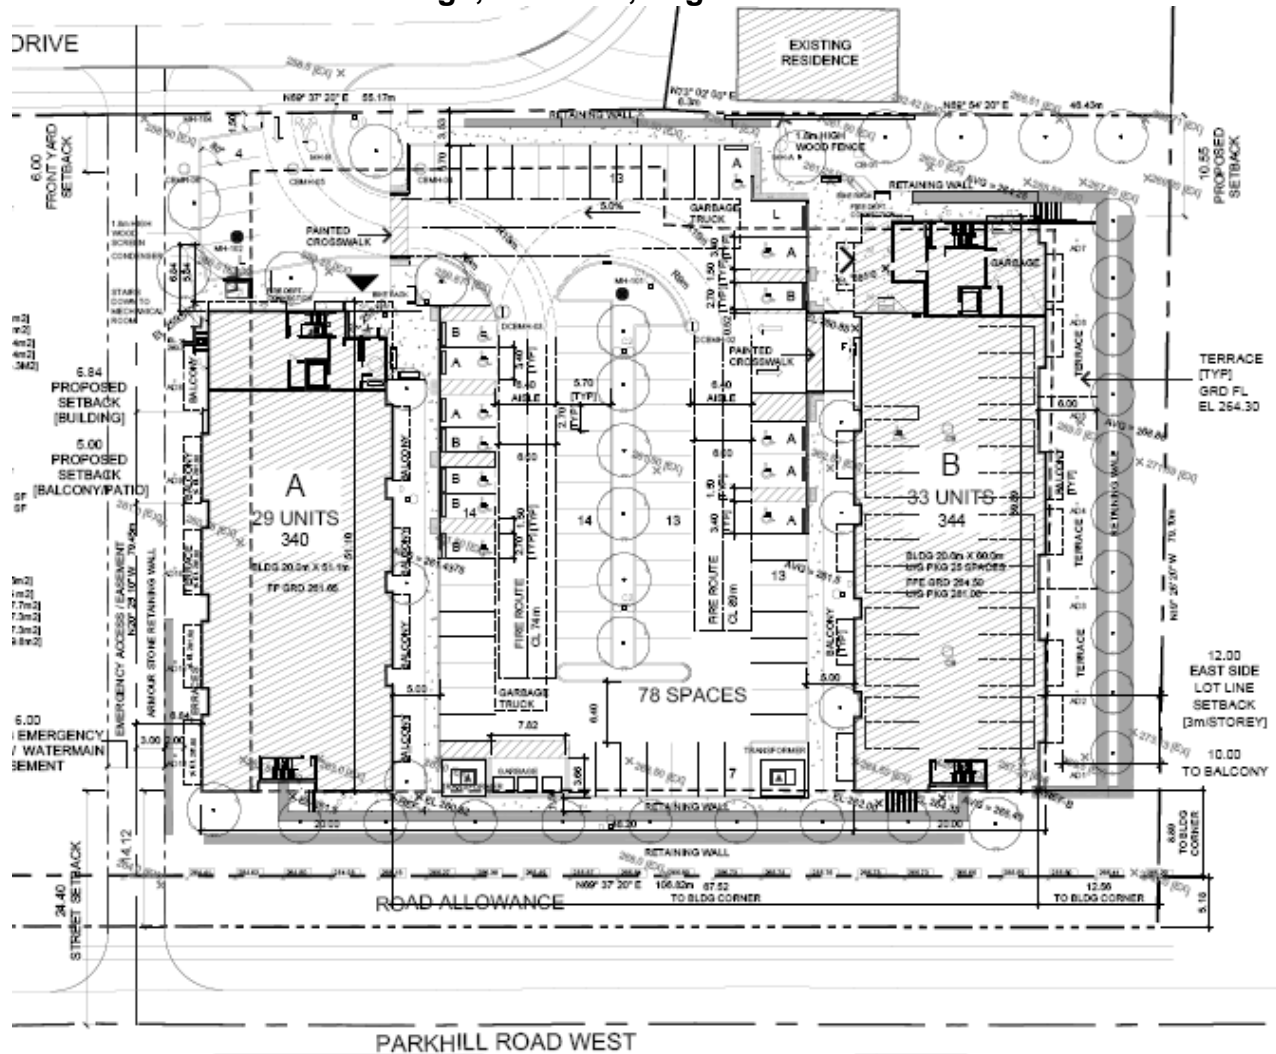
Exhibit B – Site Plan Drawings, Landscape Plan, Page 2 of 6
